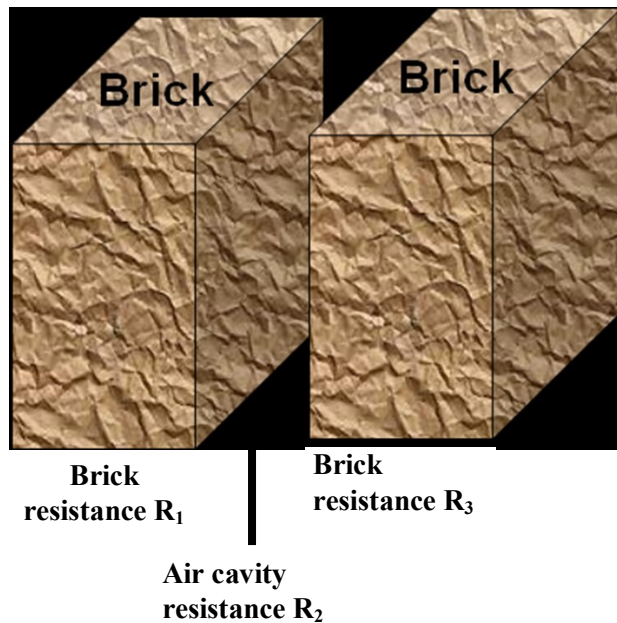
Typical structure of buildings in UK constructed between 1945 and 1960.
